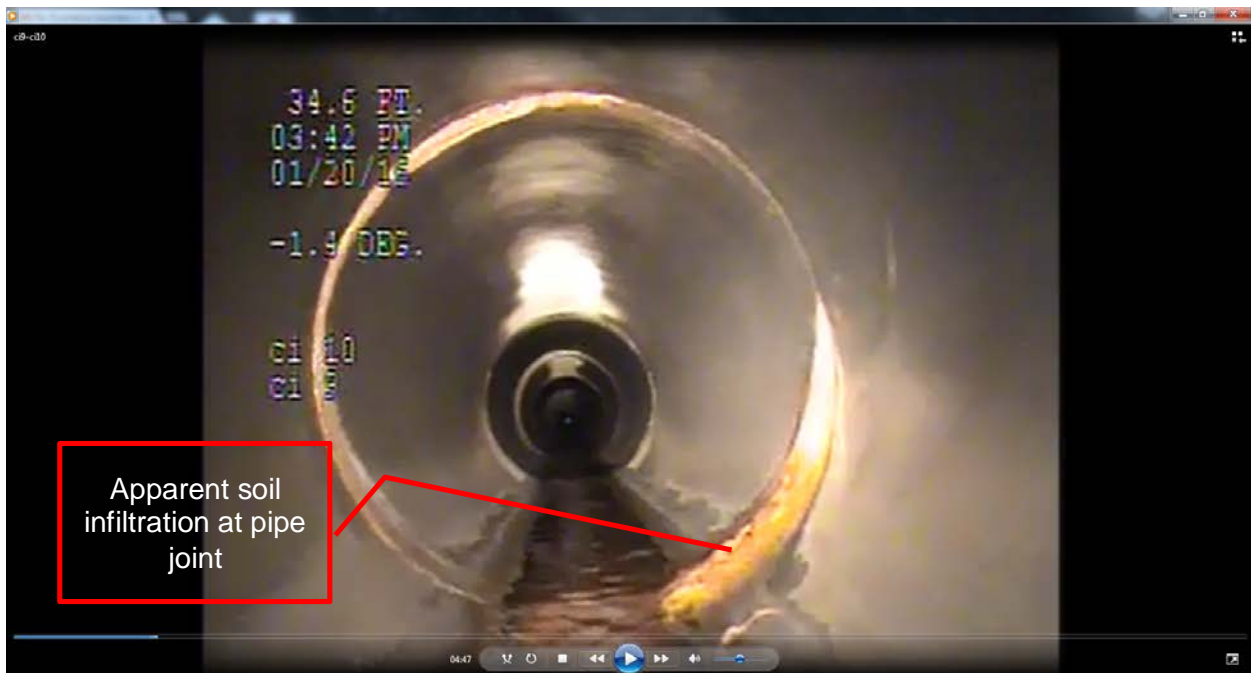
Pipe CI9-CI10: Sediment accumulation at pipe joint likely from infiltration through joint.
